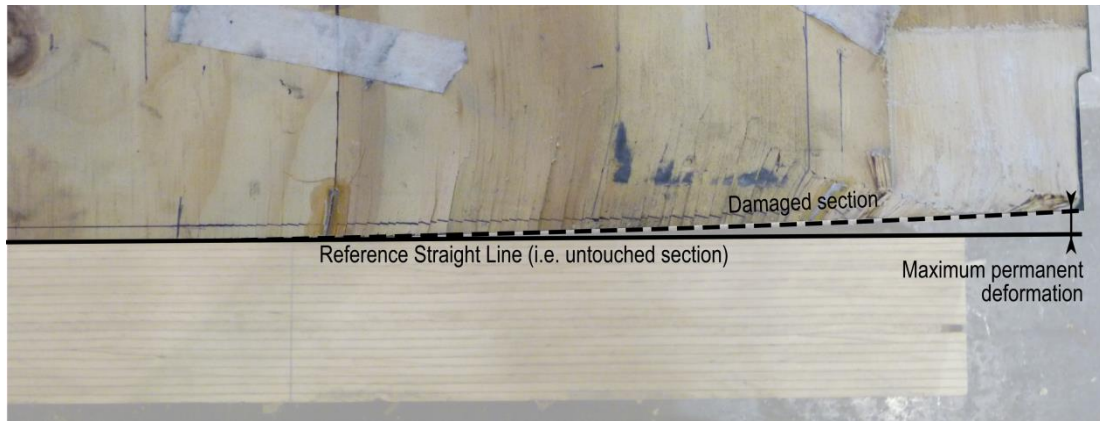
Wall damage from MCE testing (modified from Sarti (2015))
